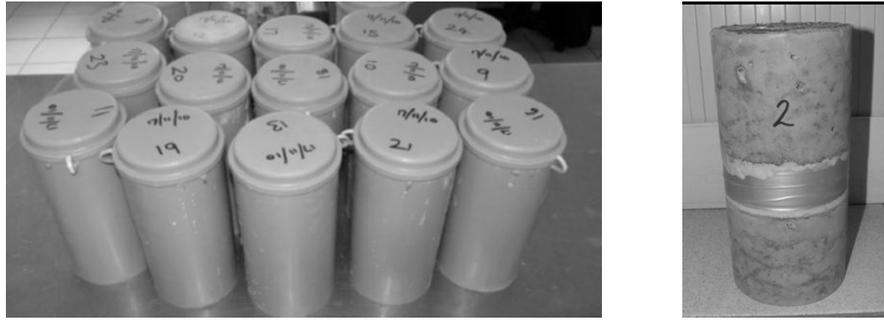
Cylinder moulds, and a demoulded cylinder prior to reduced section being stripped
